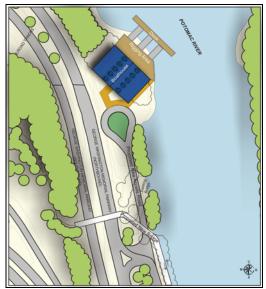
Conceptual Site Plan – Maximum Program, Rosslyn Waterfront Lower Site
